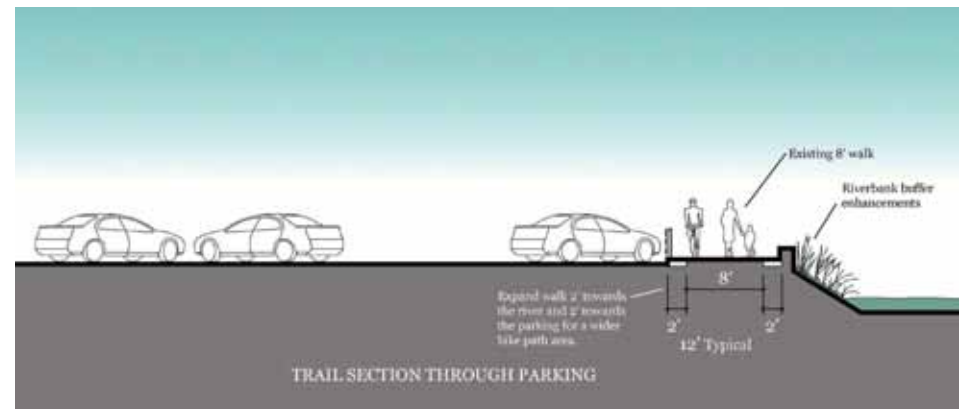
Typical section through parking area. Through the parking area, where parking spaces are adjacent to the Greenway path, a lawn /planting strip or wooden guardrail should be incorporated along the path to eliminate the problem with parked cars 'overhanging' the path (see photo above).
